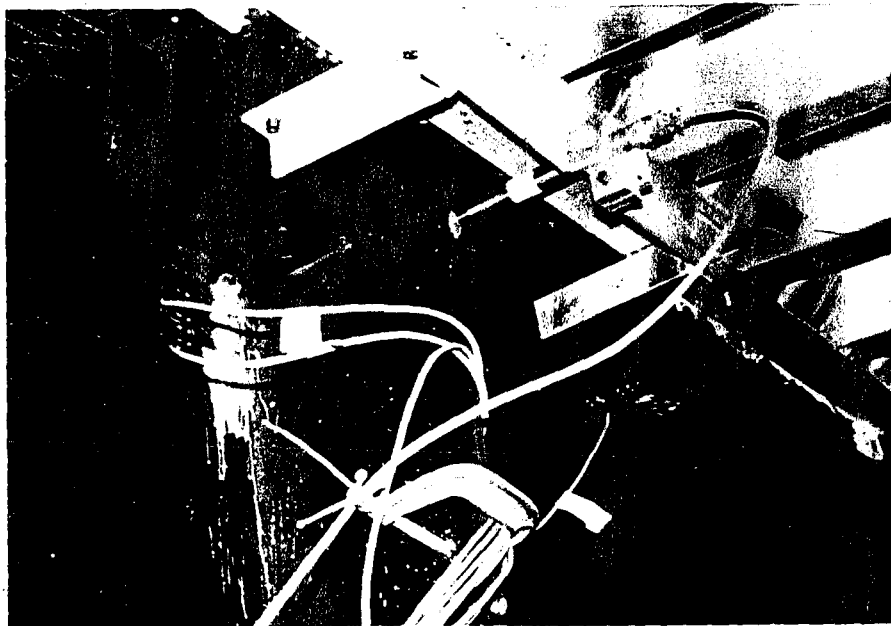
LVDT Arrangement at First Floorbeam South of Pier
